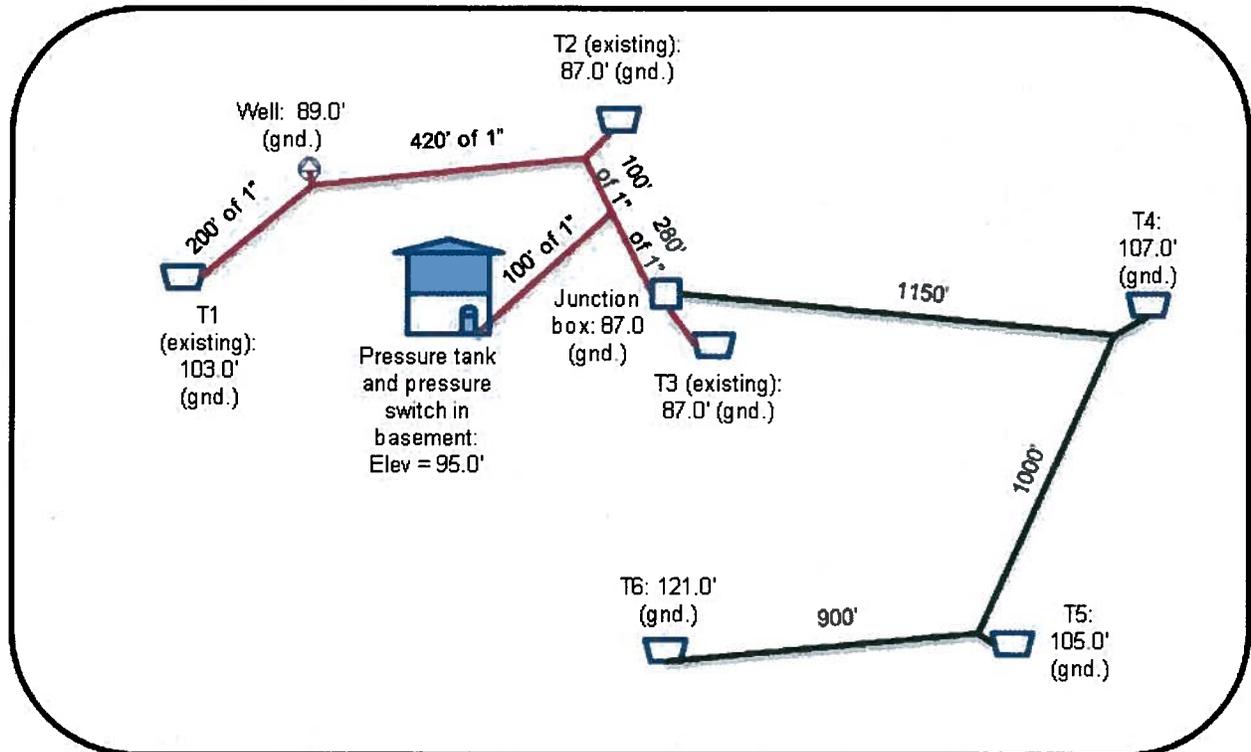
Layout for Example 3 – Adding to an Existing Pressure System
